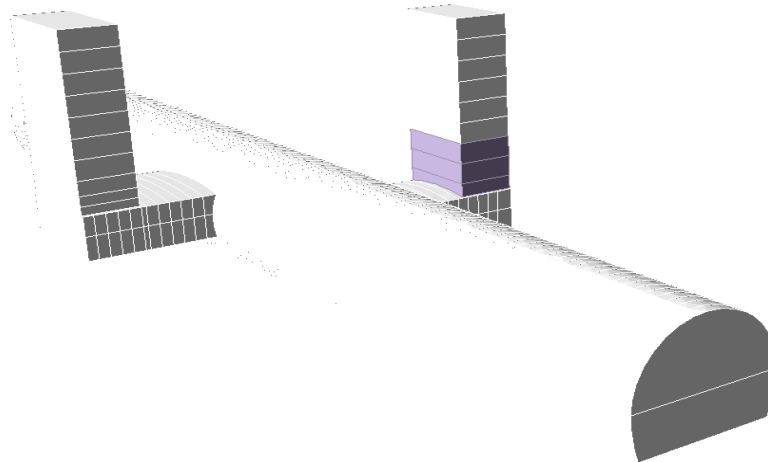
Example of the top-down full-face excavation for the vertical shaft type (b) at stage 269
